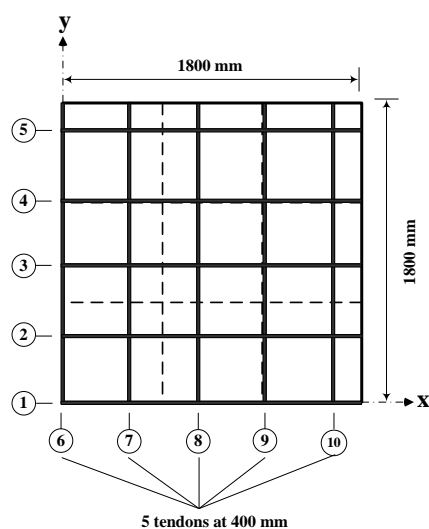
Details, geometry and layout of prestressing tendons of Ritz's et. al. ^[12] slab
